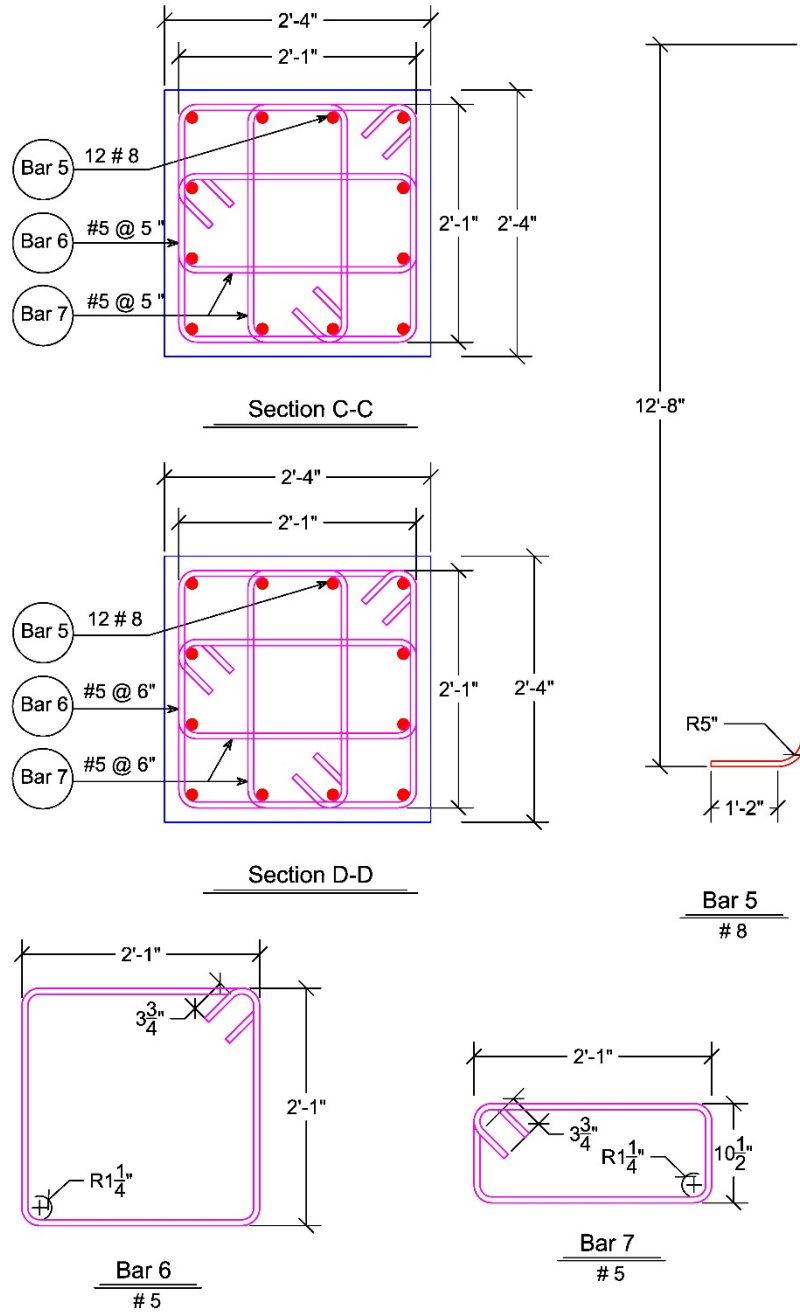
Reinforcement Details for Perimeter Frame (PF) Column Specimens
